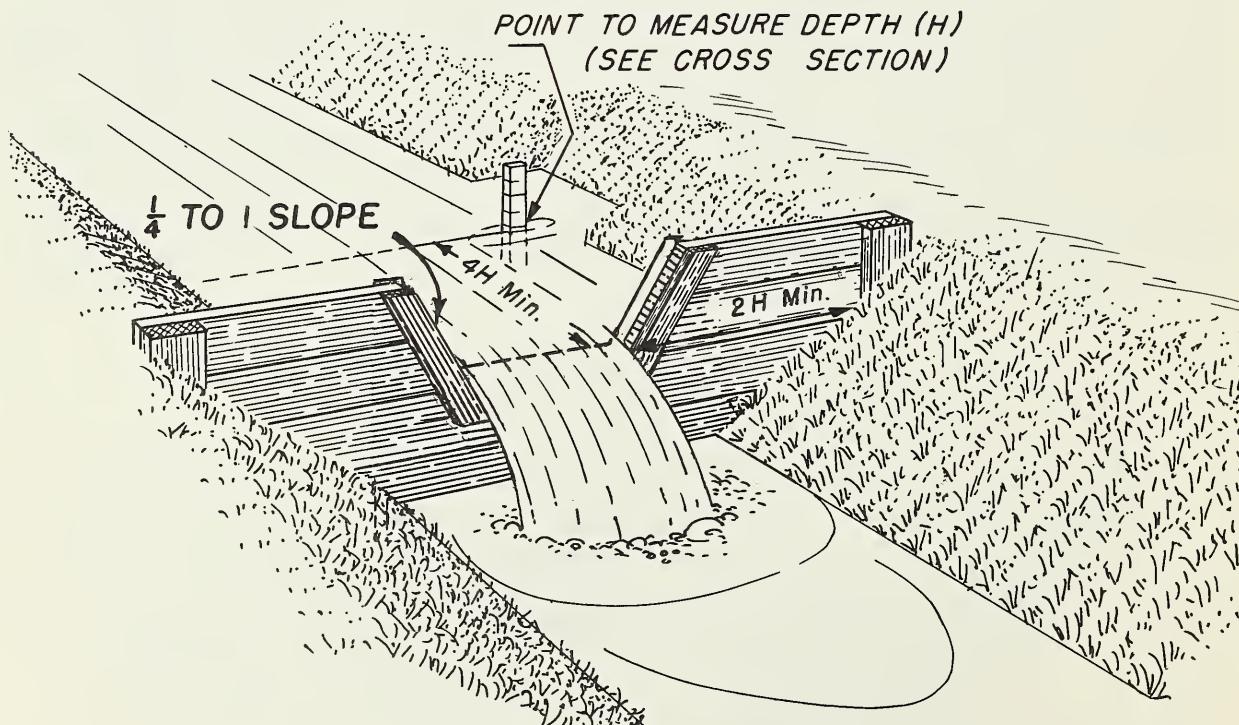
Trapezoidal-notch or Cipolletti weir
